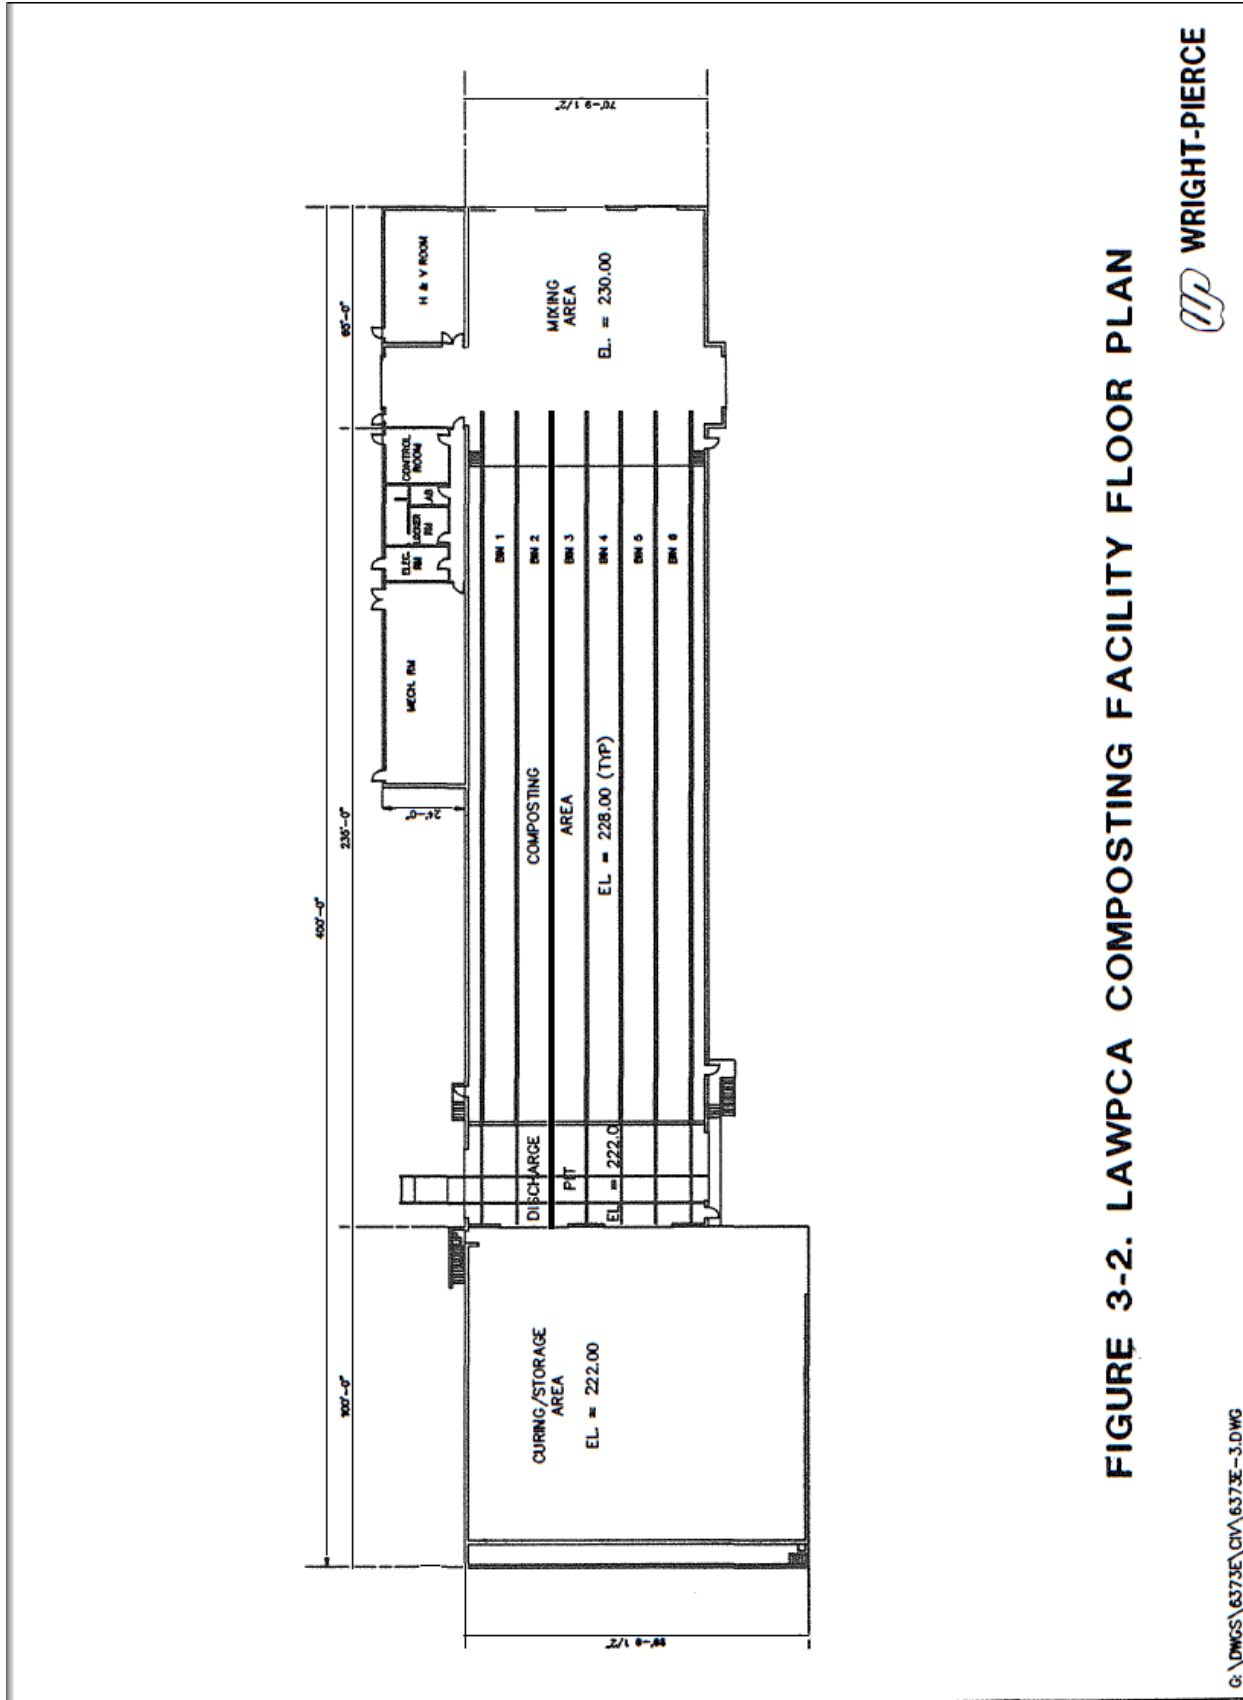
LAWPCA COMPOSTING FACILITY FLOOR PLAN
